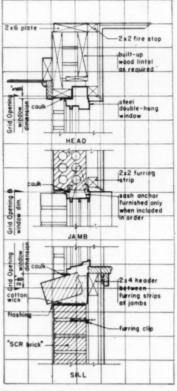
Steel double-hung window installation in the "SCR brick" wall
